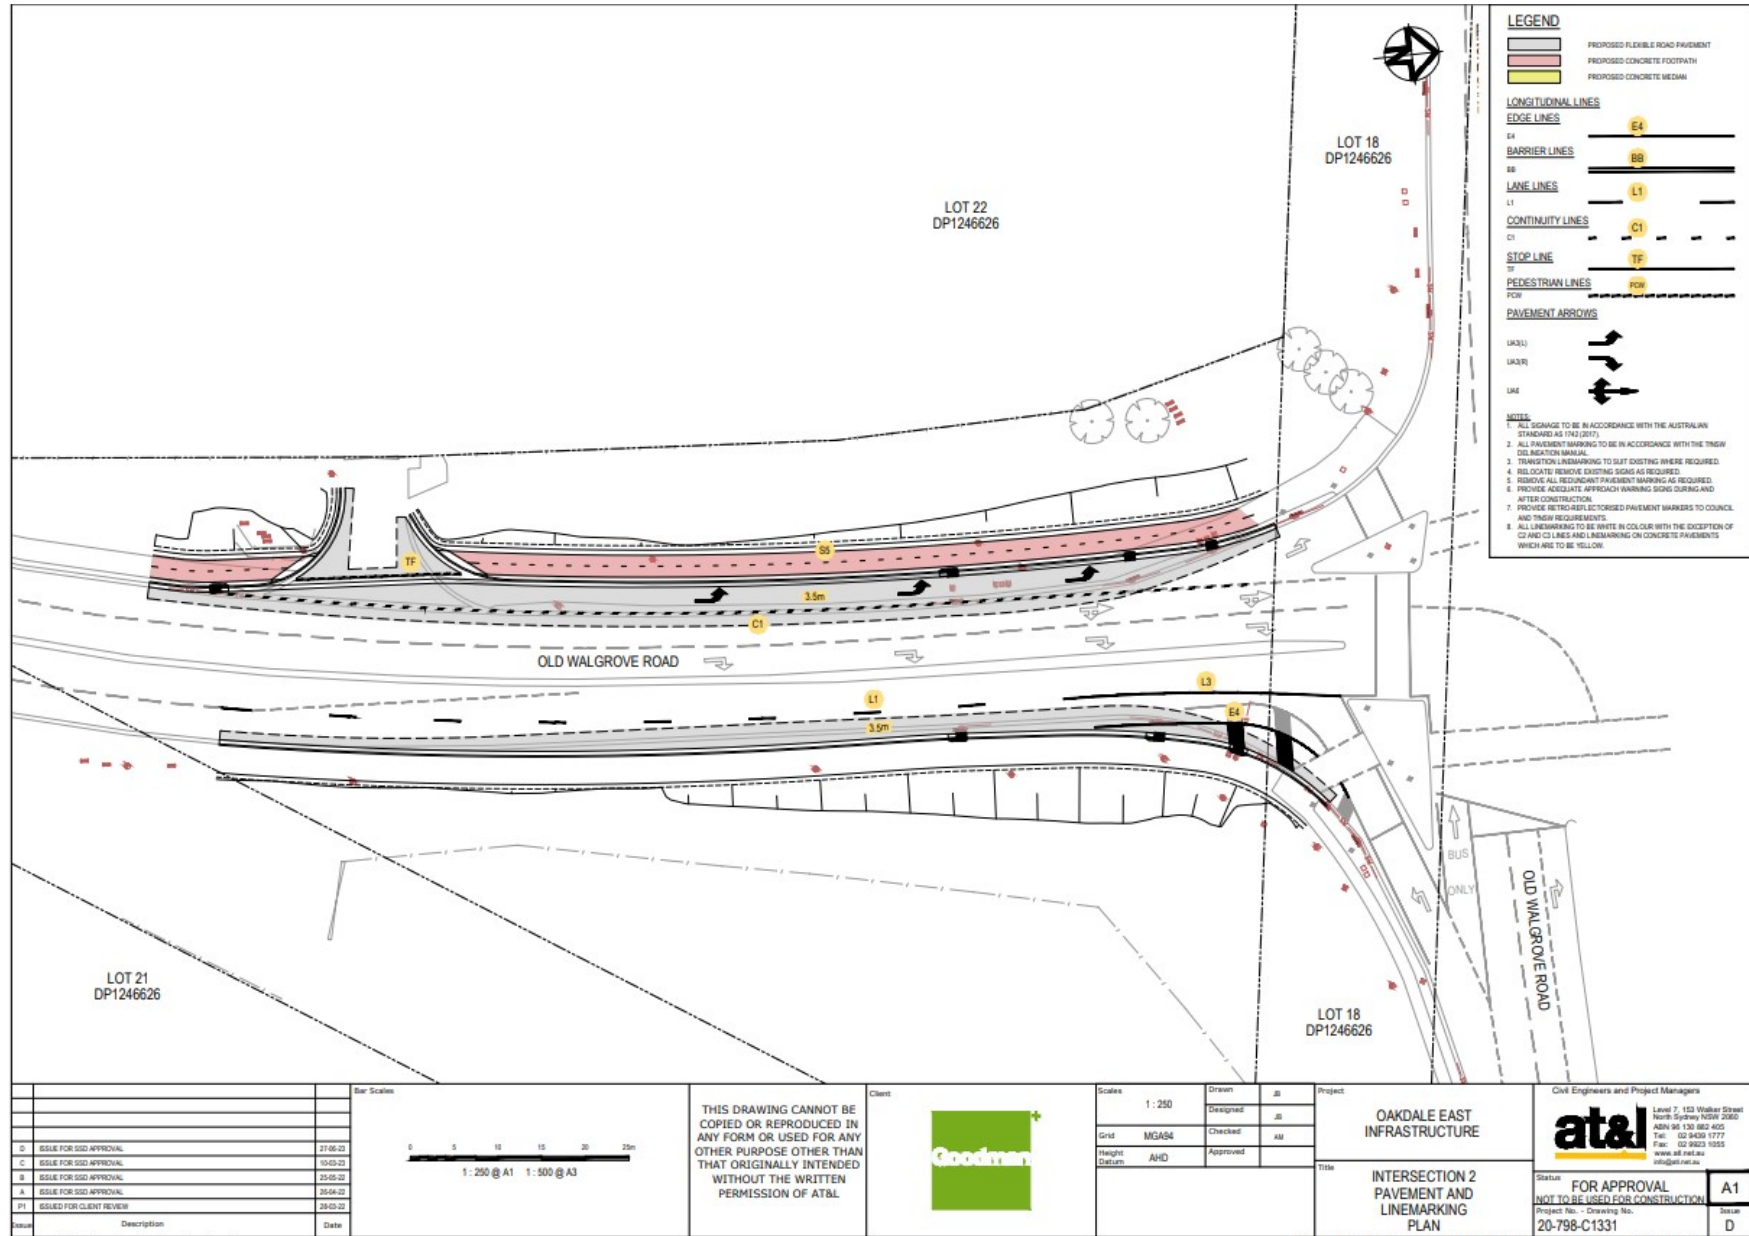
Intersection Upgrade Works – Old Wallgrove Road / Lenore Drive
